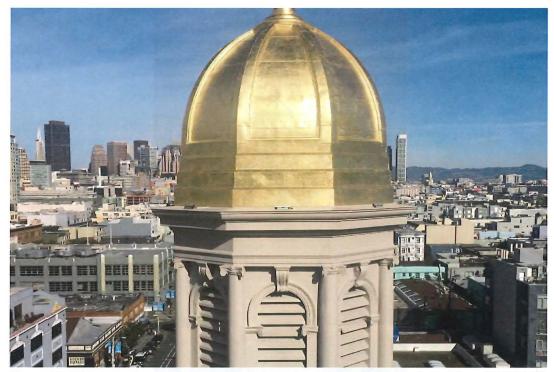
Gilded sheet metal dome and top of sheet metal cupola. (Palisade Builders, 05/20/2018)
